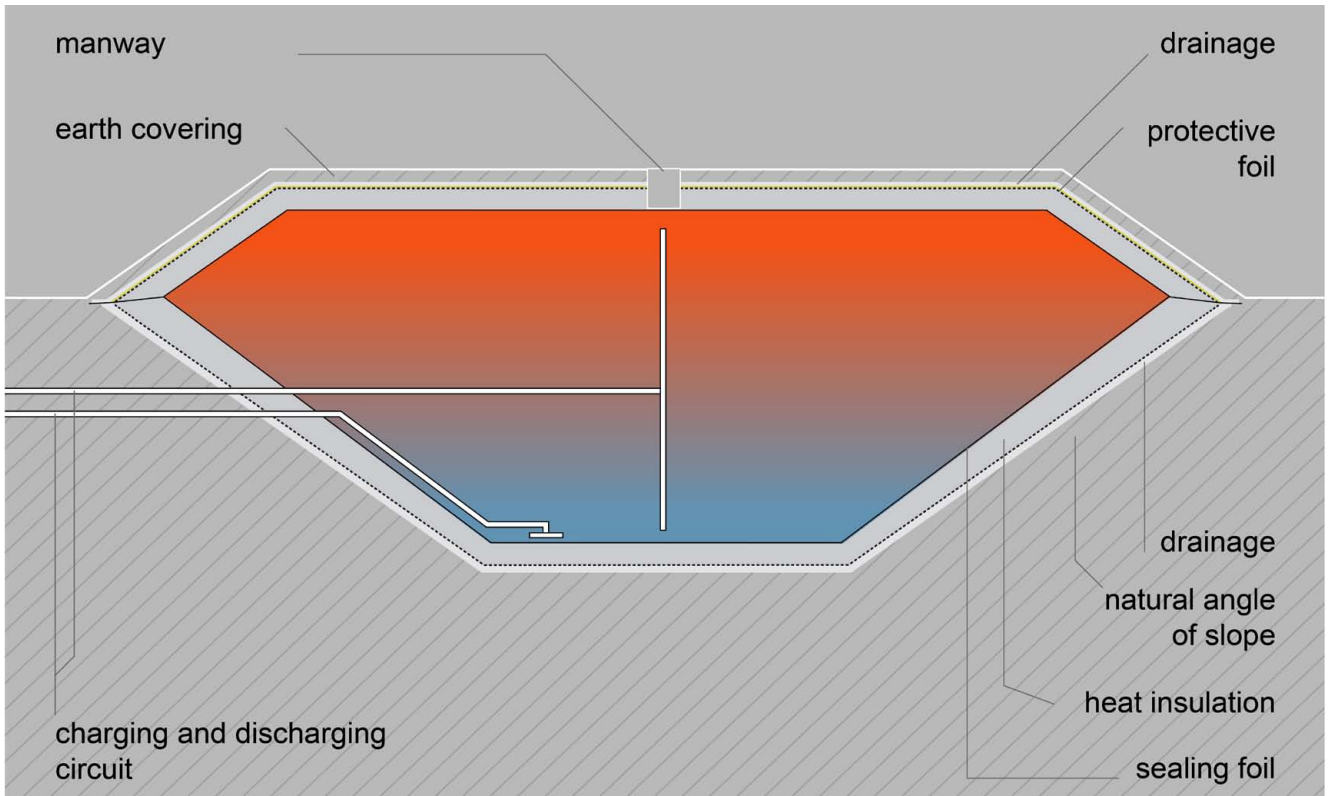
Construction method of a pit thermal energy store (source: solites)
